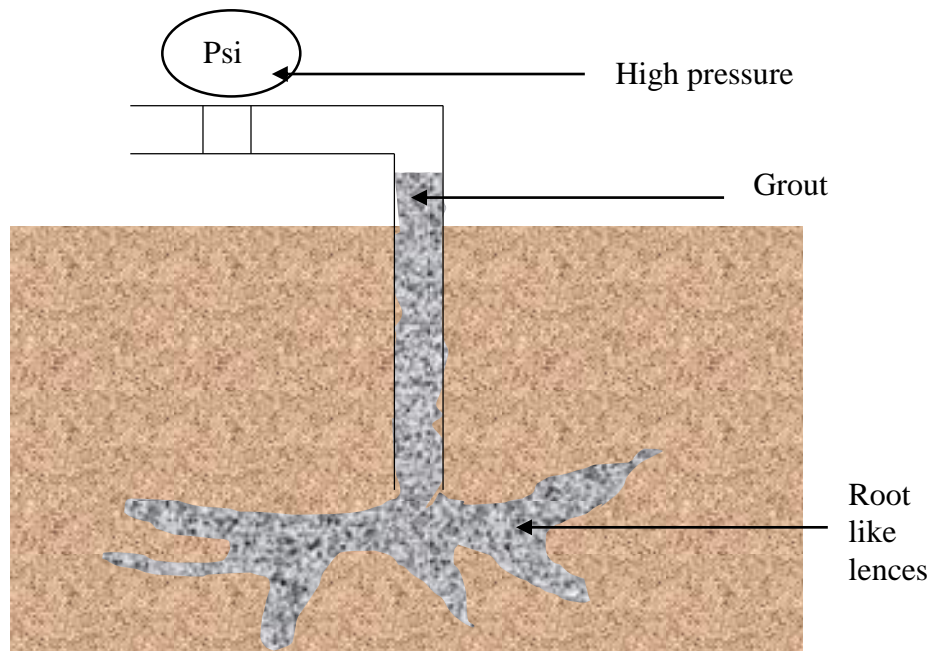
Fracture grouting (Geo grout, 2019)
